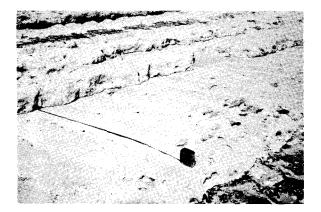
Closeup of Merritt Dam showing erosion of feathered edge—September 1968, 6 years after construction. Photo P637-D-66531
